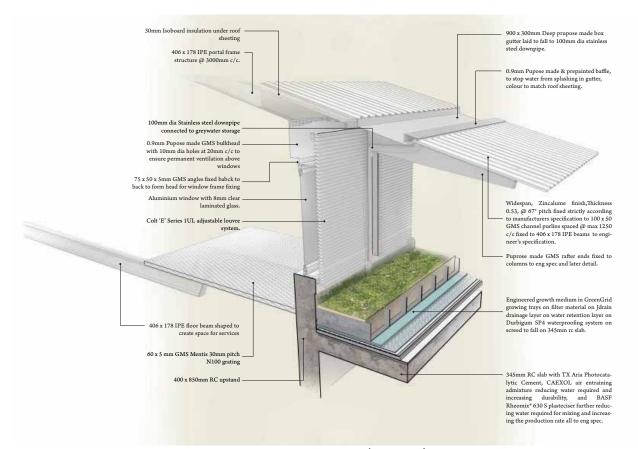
3 Dimensional Detail - Portal Frame and Green Roof Junction (By Author).
